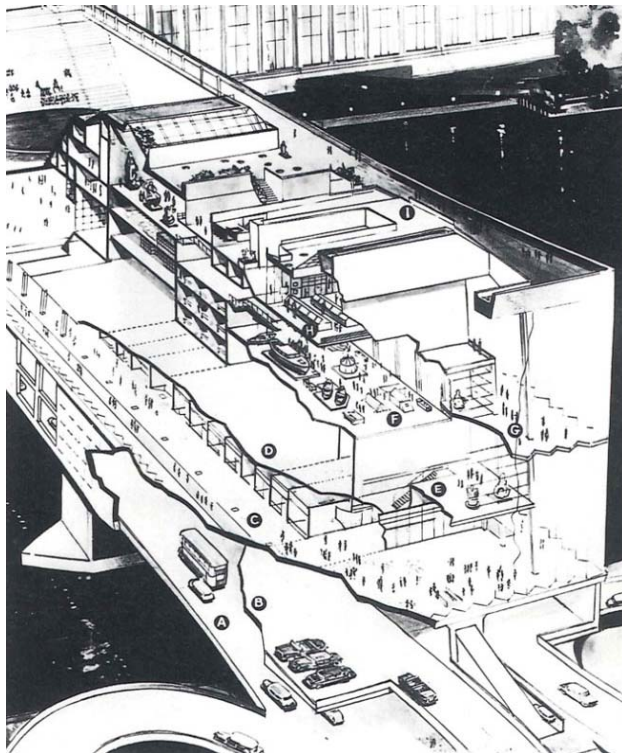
Crystal Span Bridge (Ove Arup archive)
